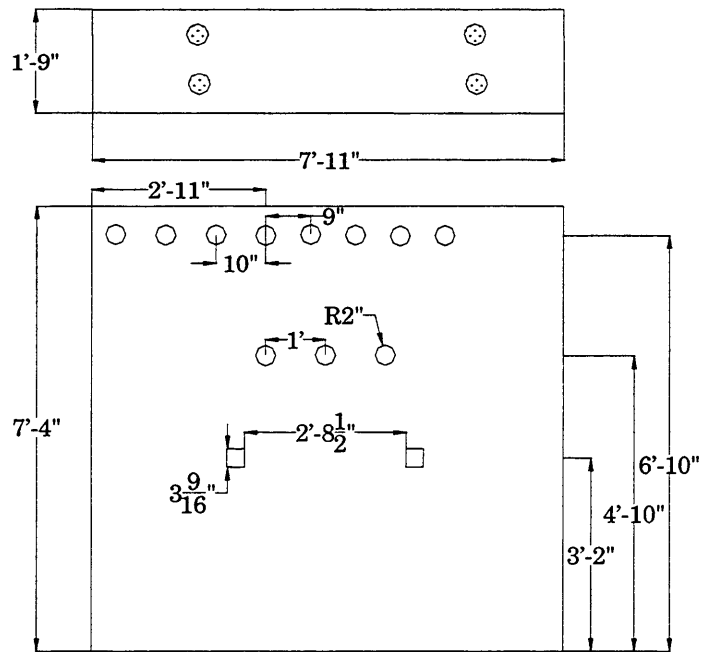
NI-1 will be used for the inner portion of the wall.
